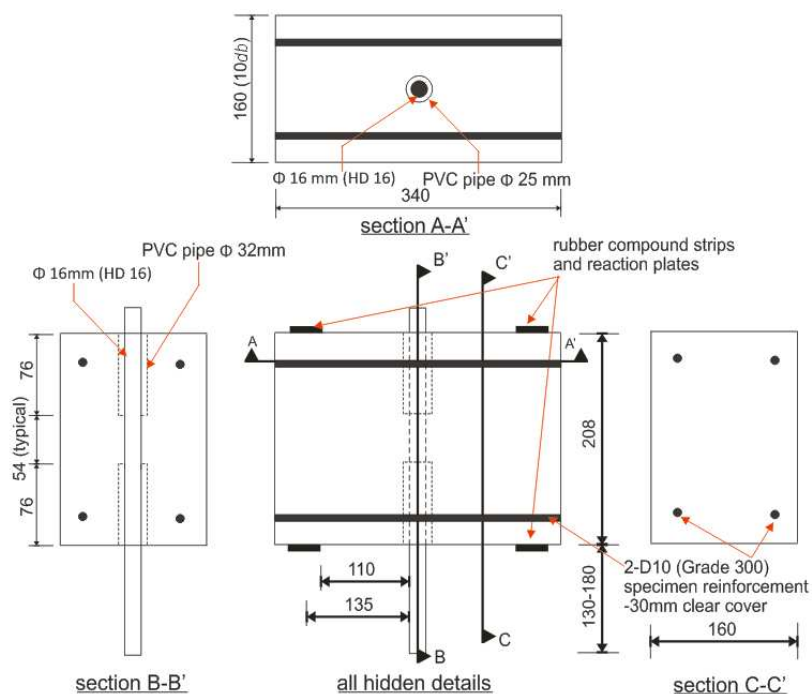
Typical details for bond pull-out specimens showing side elevation and respective cross sections.
